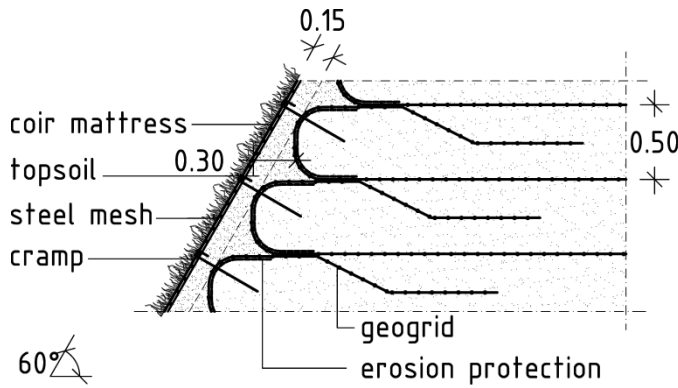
Wrap-back wall with separate topsoil cover provided on-site
